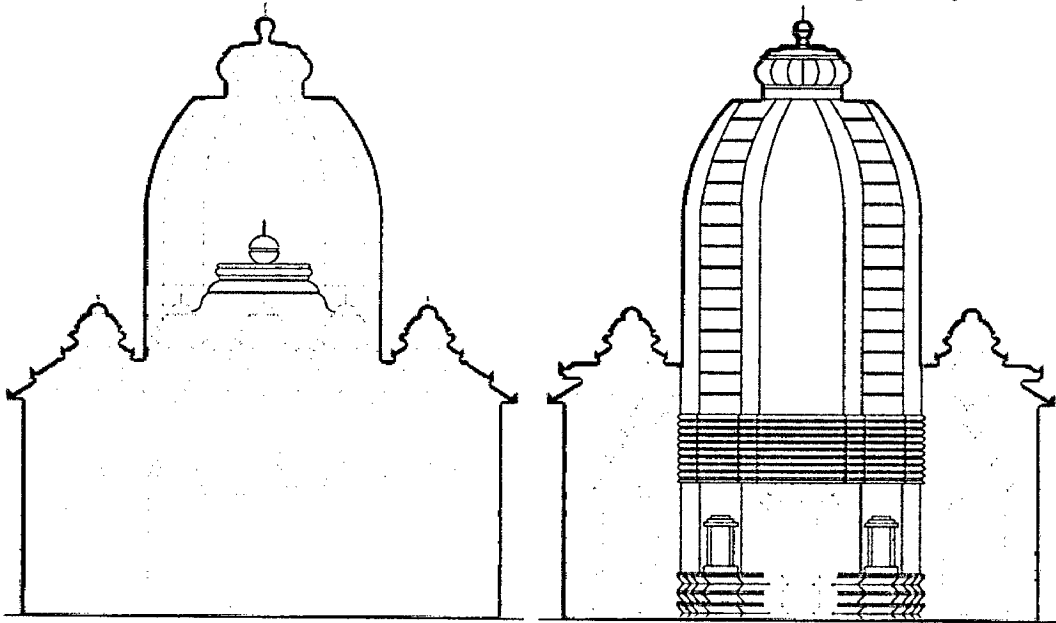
Plan of Nila Madava temple Kantilo 1
